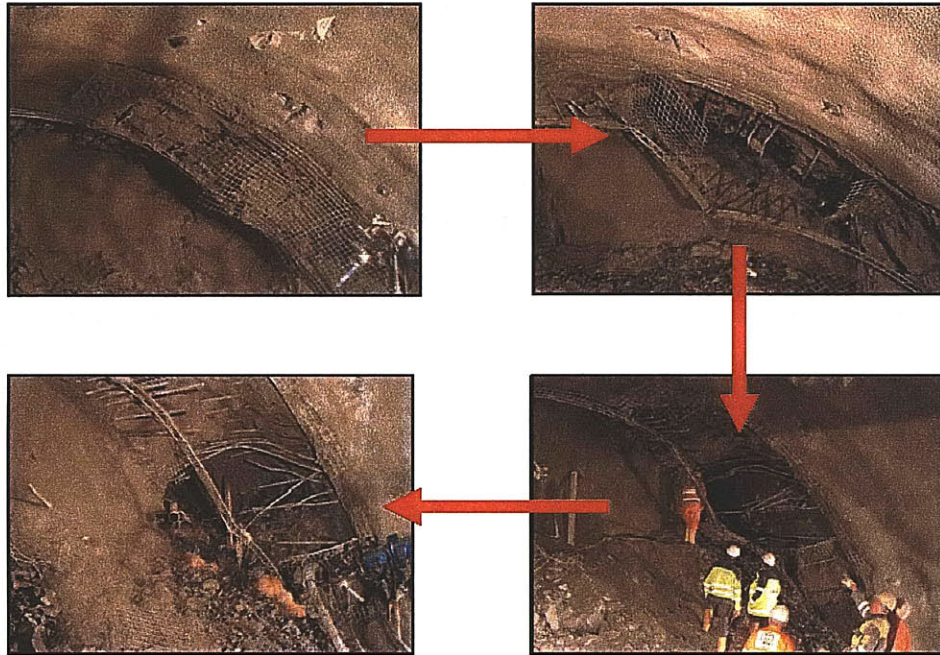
Collapse progression at Wienerwald tunnel (Seidenfuß, T., 2006)
